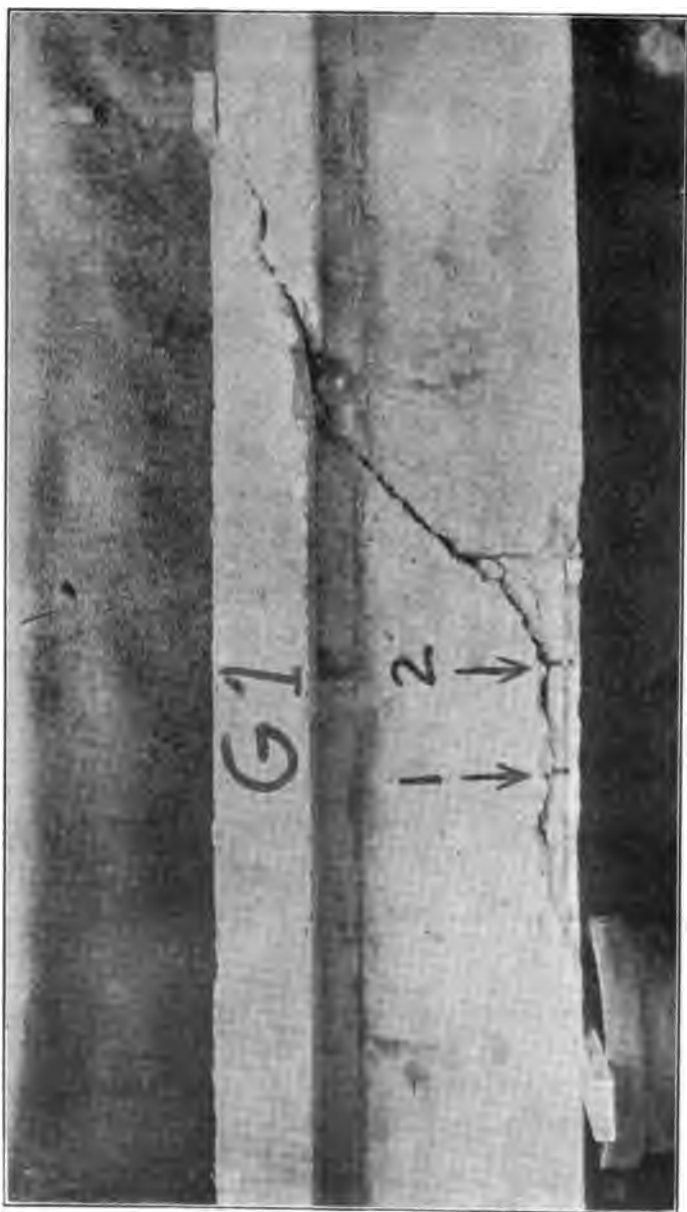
PLATE VI.—FAILURE CRACK IN TEST-PIECE G1.
